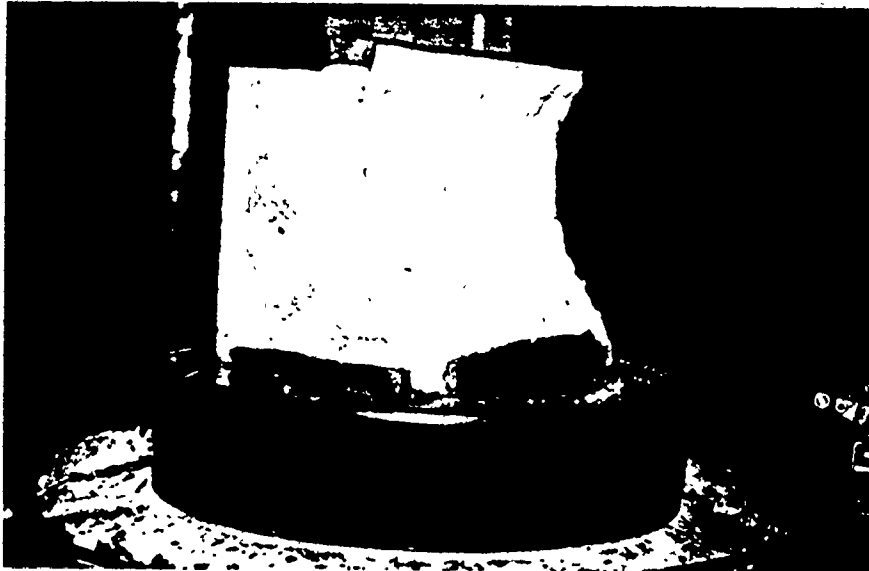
A TYPICAL FAILURE OF GROUTED SPECIMENS TESTED
